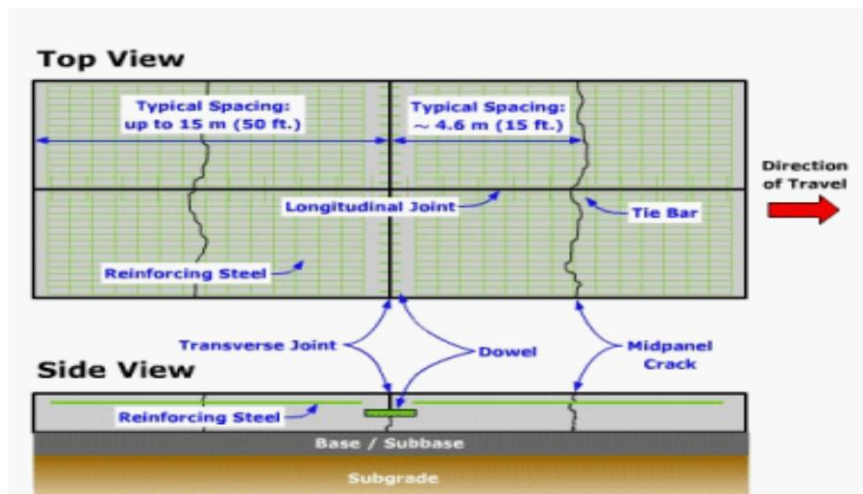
Jointed Reinforced Concrete Pavement (JRCP)
